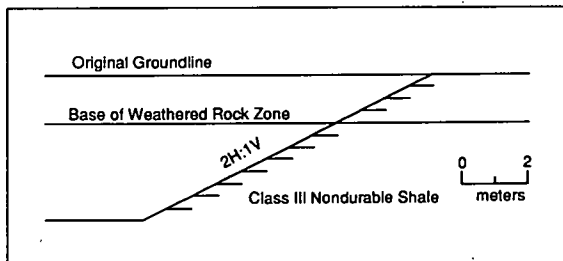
Typical slope configuration in Class III nondurable shale (modified from Kentucky Department of Highways 1993).
